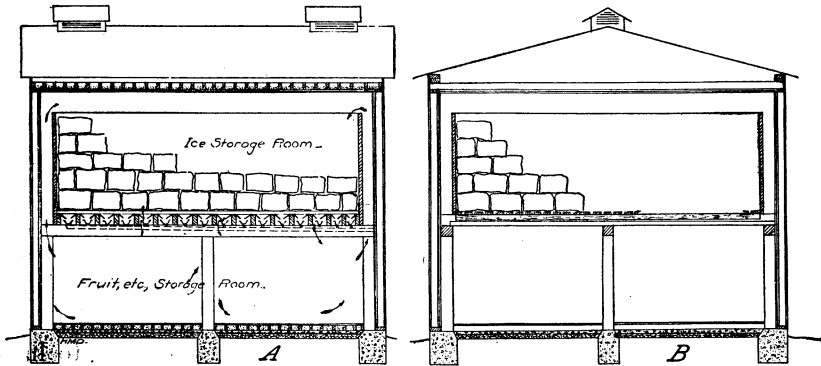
Diagrams showing cross sections of a building planned for storing ice above and fruit below: A, Longitudinal section; B, transverse section.
